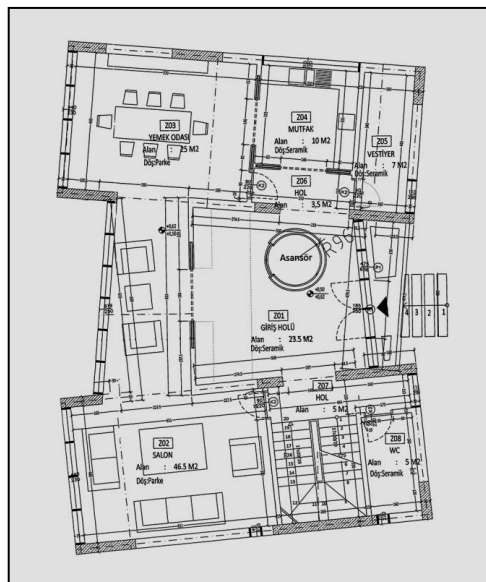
Floor plan of Orhangazi avenue, no:99 [157] (u)
